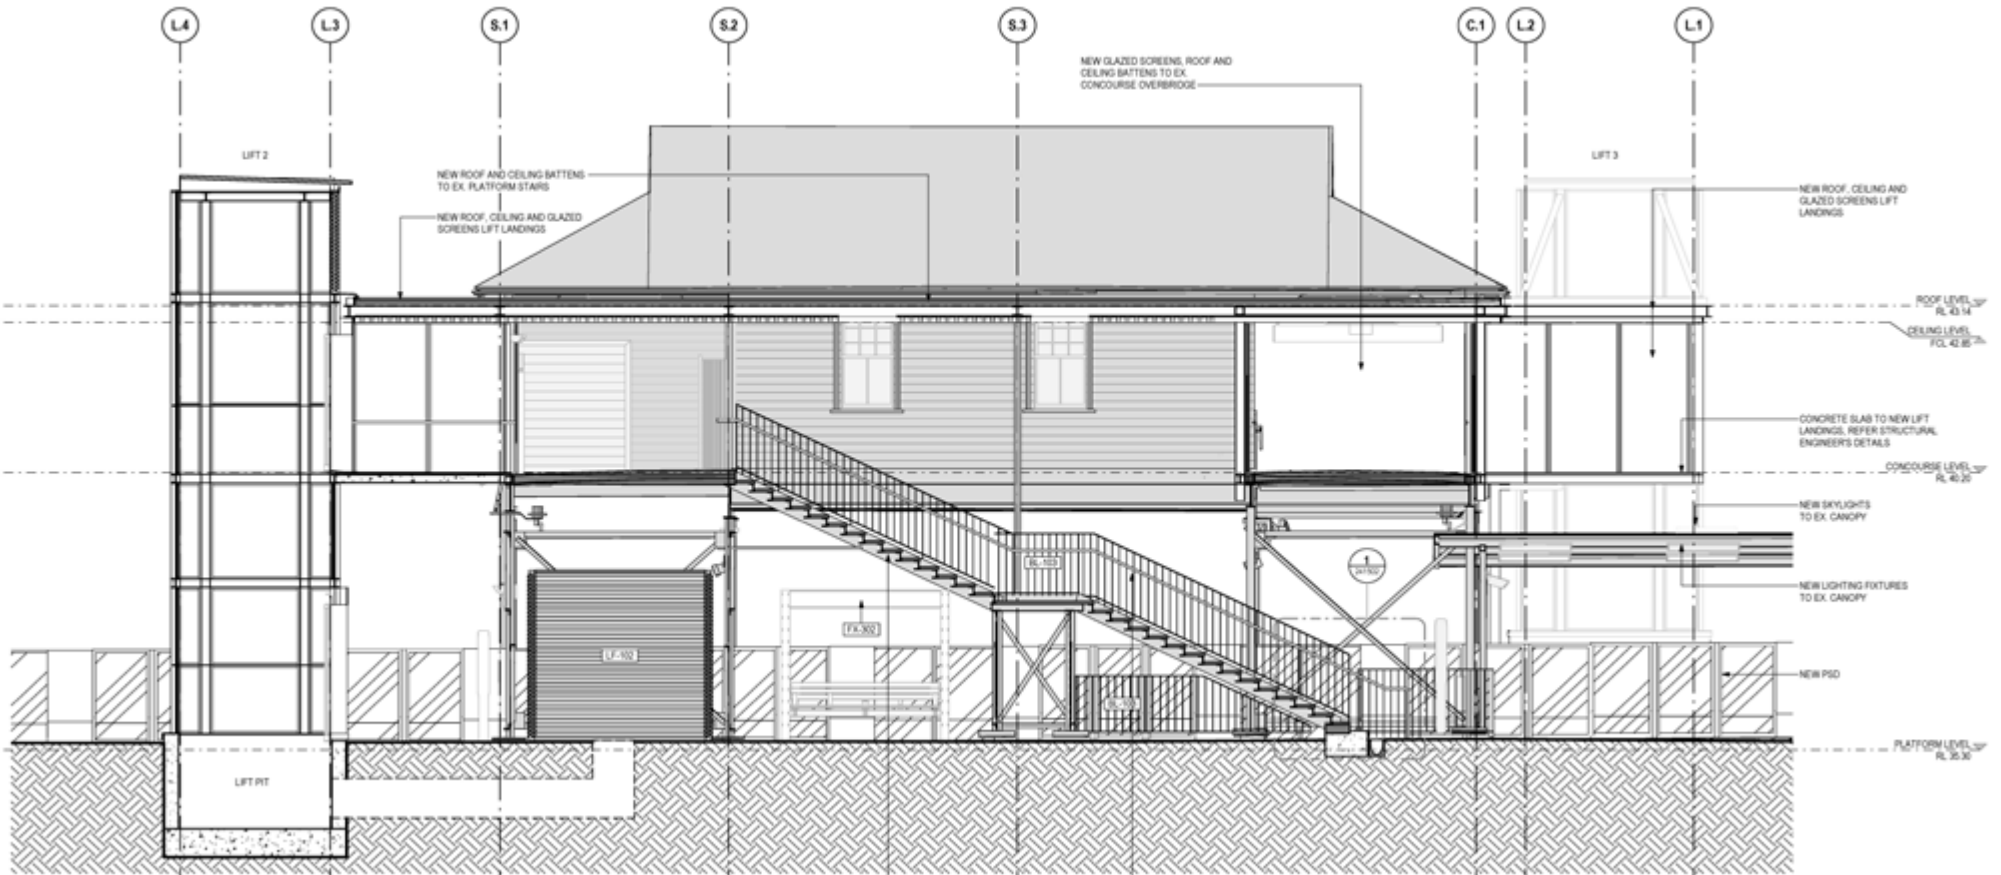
Cross section through platform showing new lift and refurbished stair
